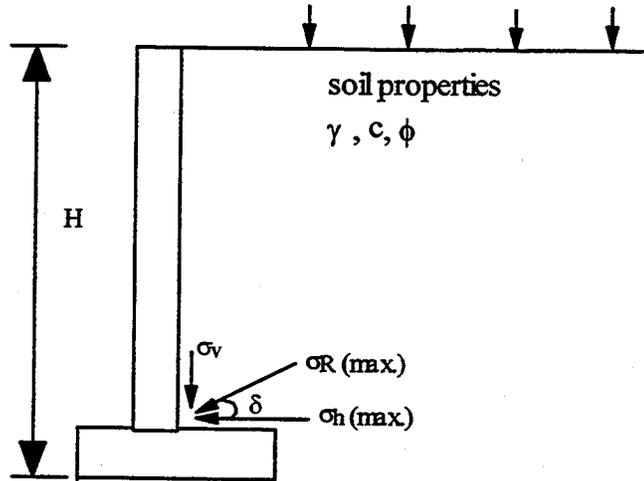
Cross-section of retaining wall details and soil and surcharge stresses.
